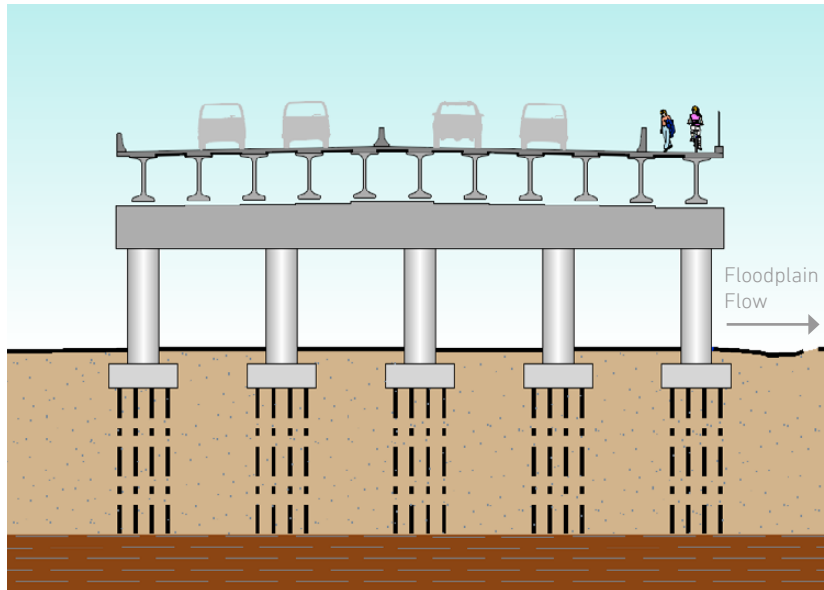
| Typical Cross Section for Bridge Main Span
